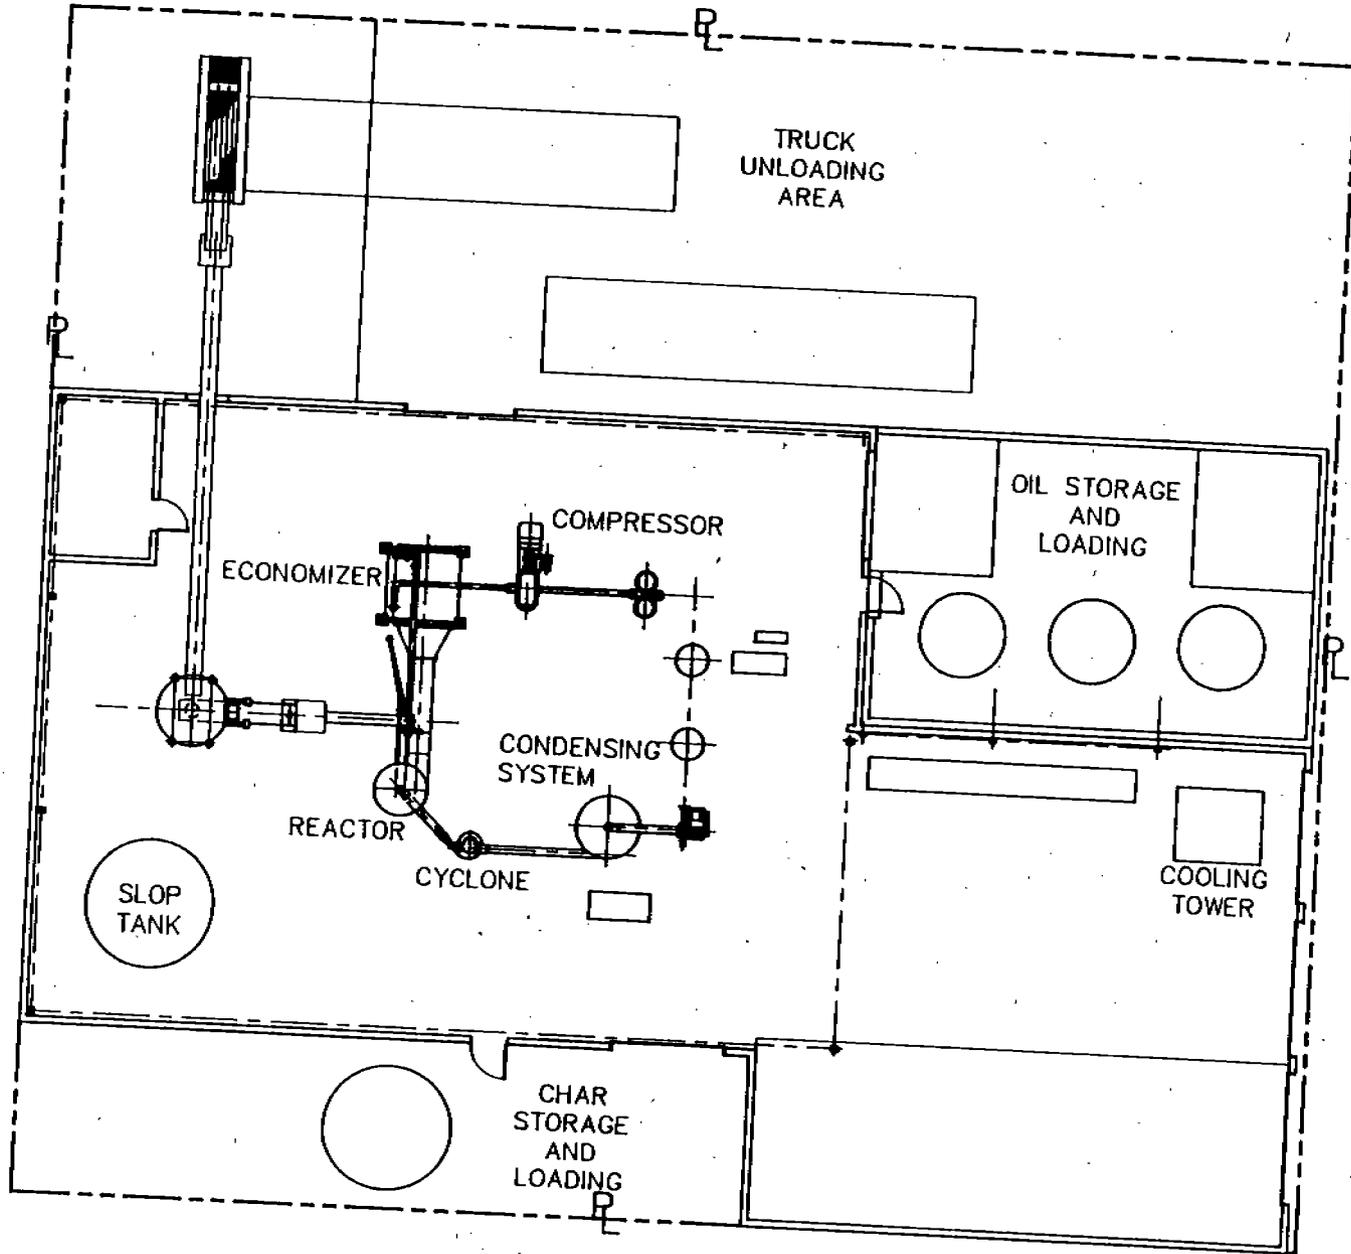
Site layout for a 36 TPD fast pyrolysis facility.
